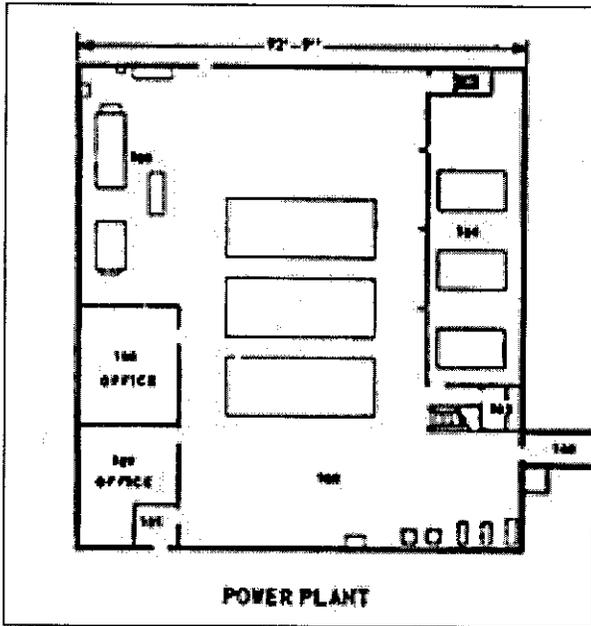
Floor plan, Donnelly power plant. LMSC 4-506.
